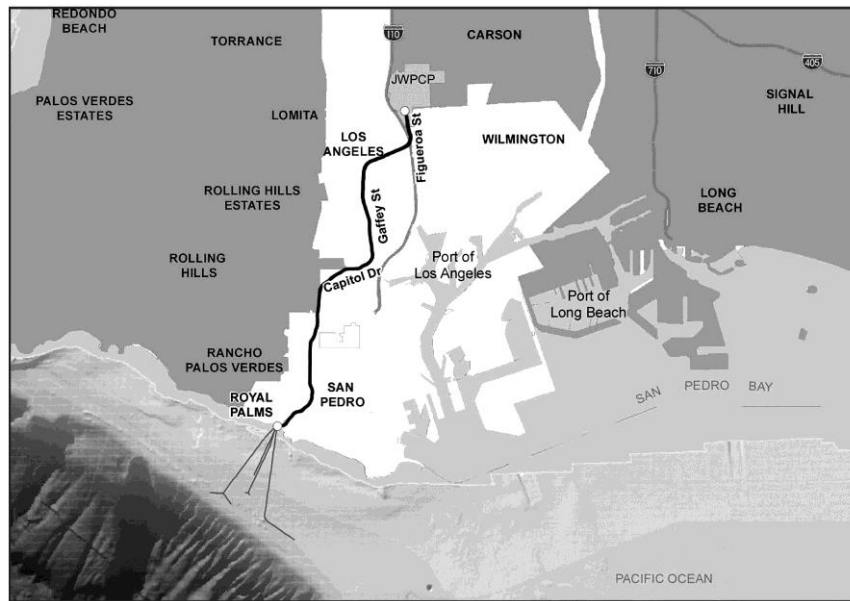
Plan of tunnel alignment (after Haug et al., 2015)
